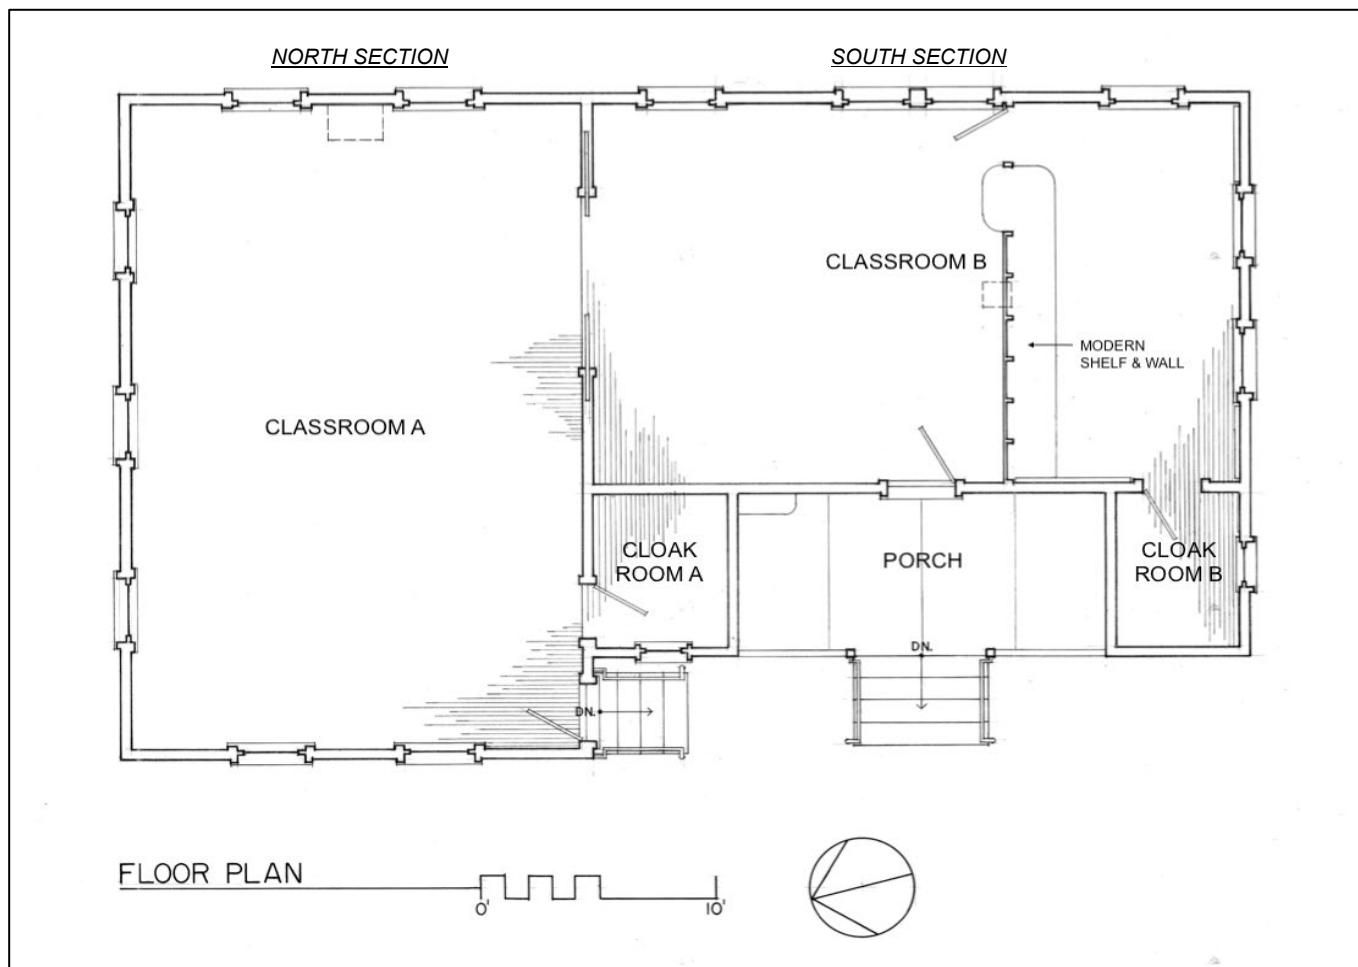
Floor plan of Rocky Branch School (Image Source: Joseph D. Lahendro, historic architect, May 2025).
